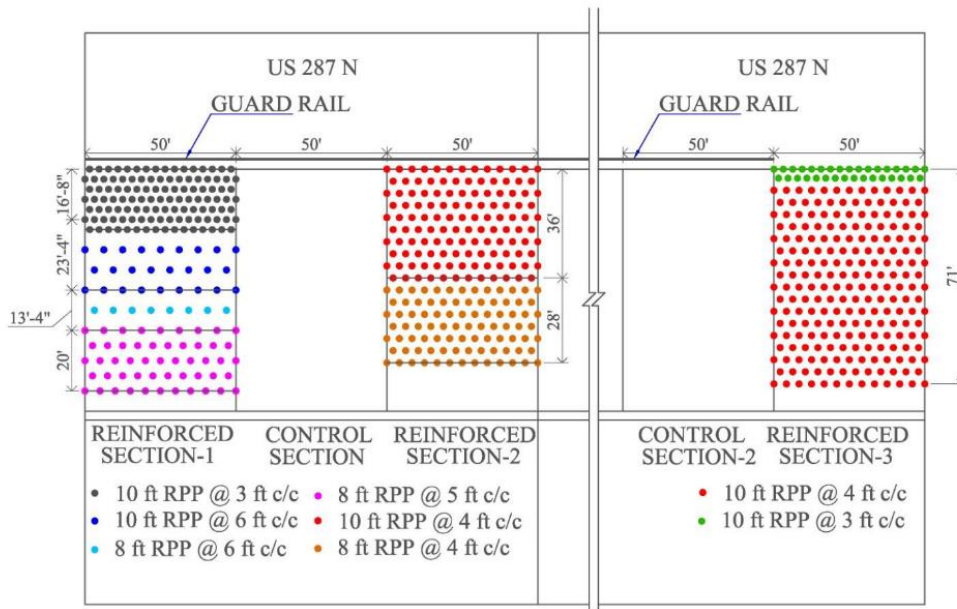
Slope stabilization plan using RPPs (Khan, 2014).
